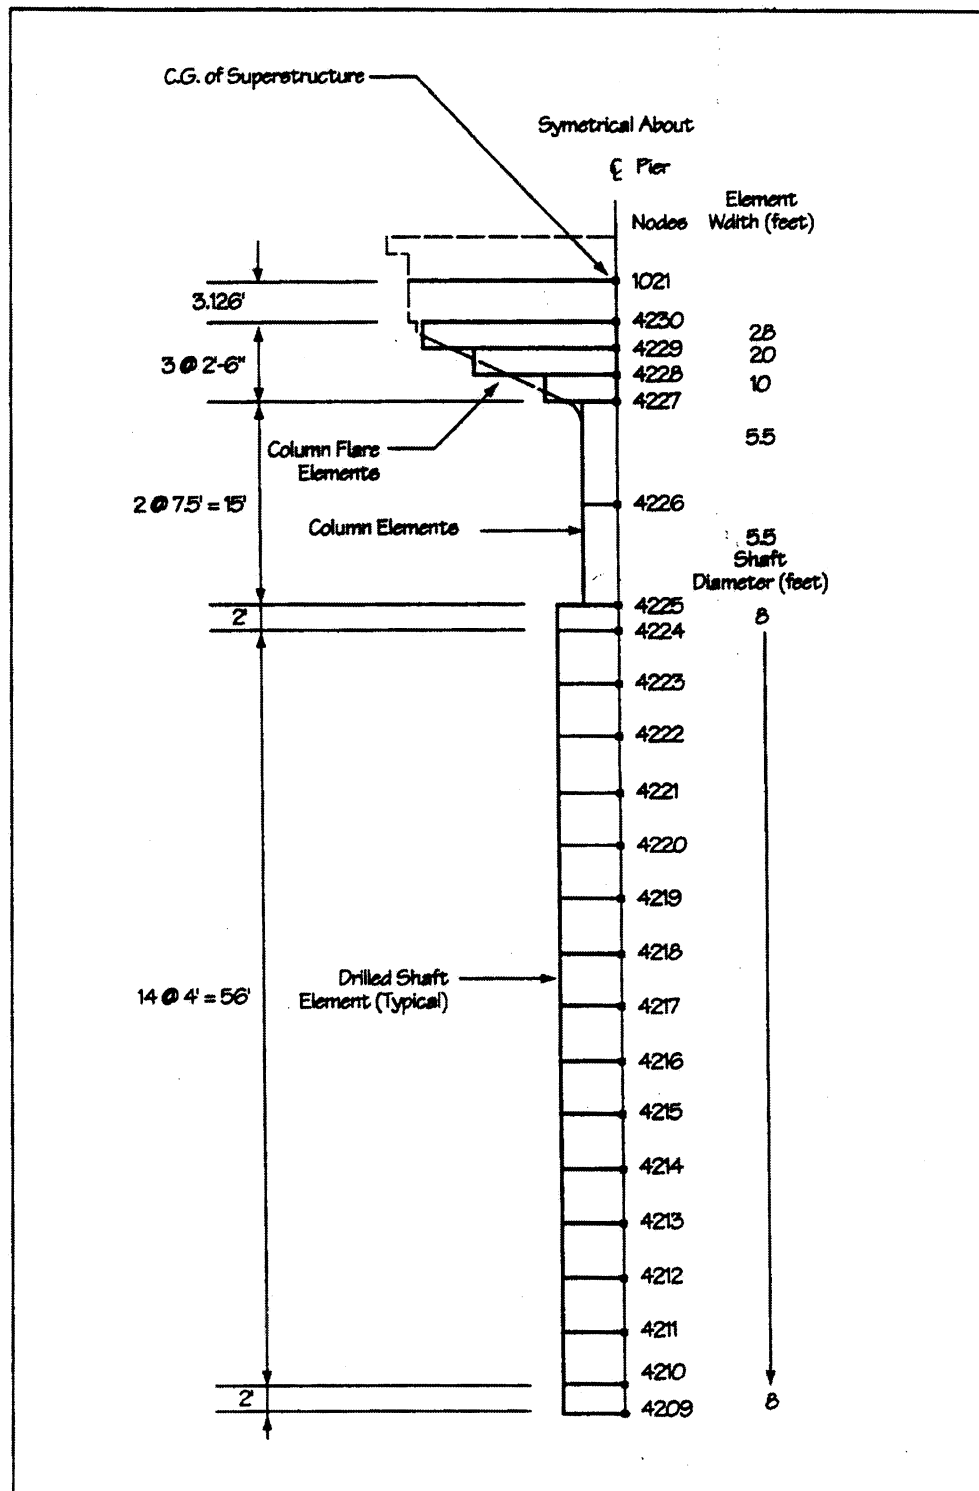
Bridge No. 6 – Pier Geometry and Element Layout
